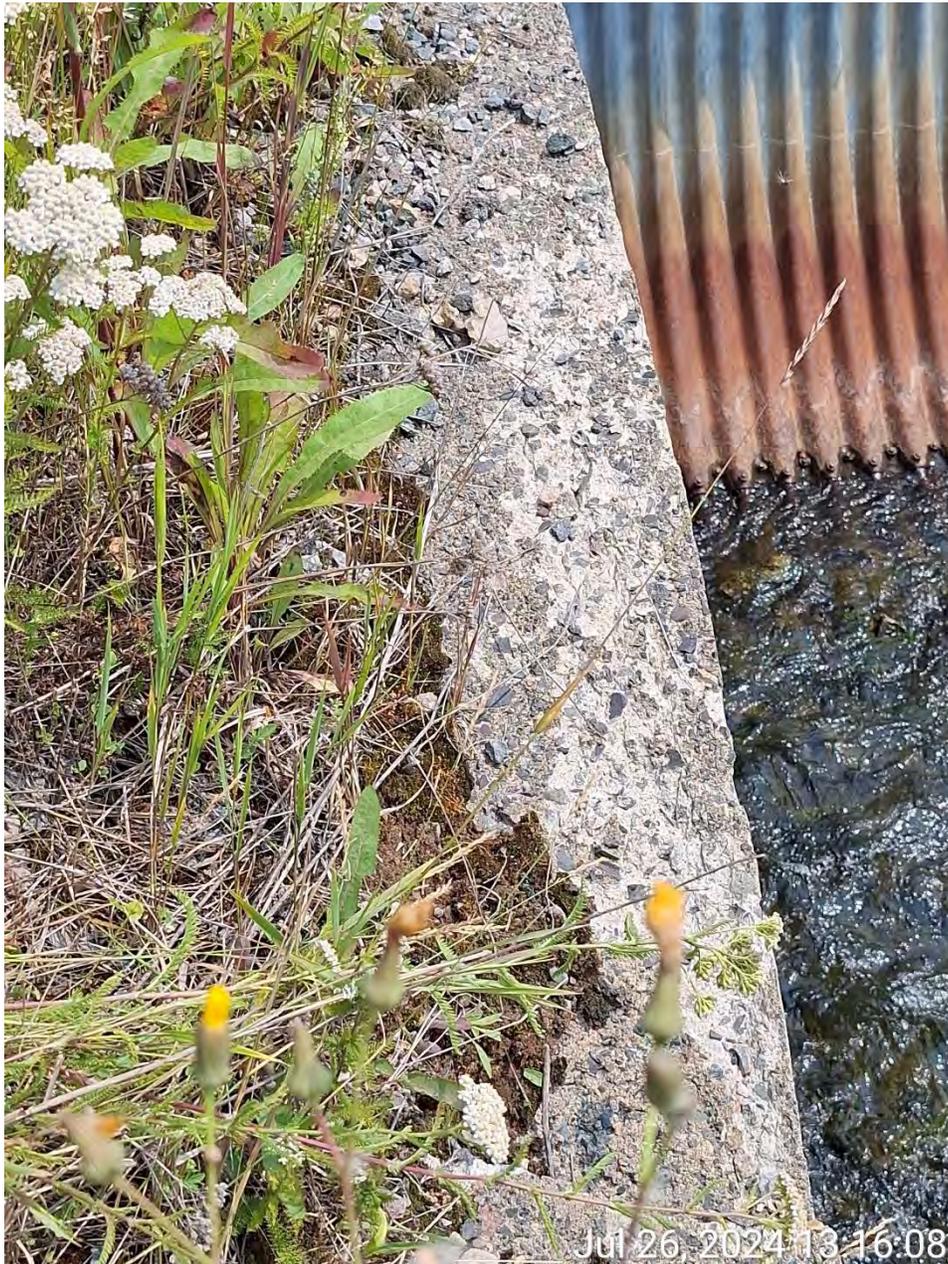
Severe corrosion of culvert barrel, bolts and nuts.
